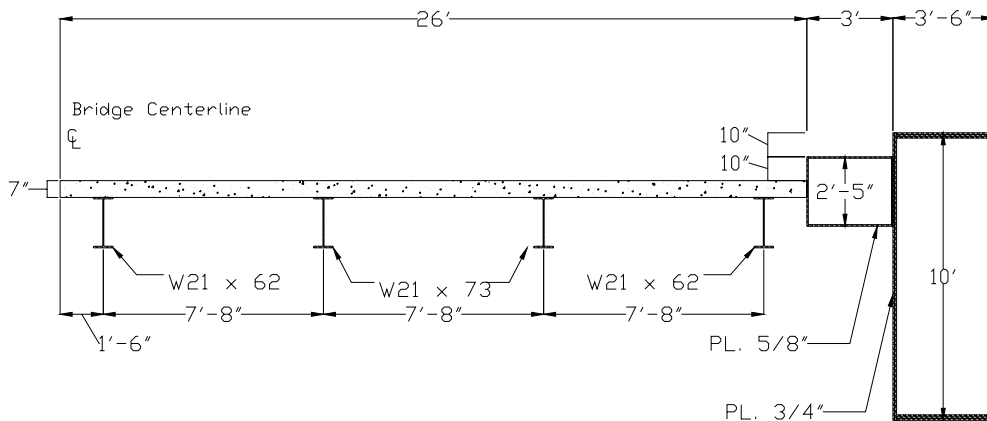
Cross Section of Deck, Stringers, and Girder
